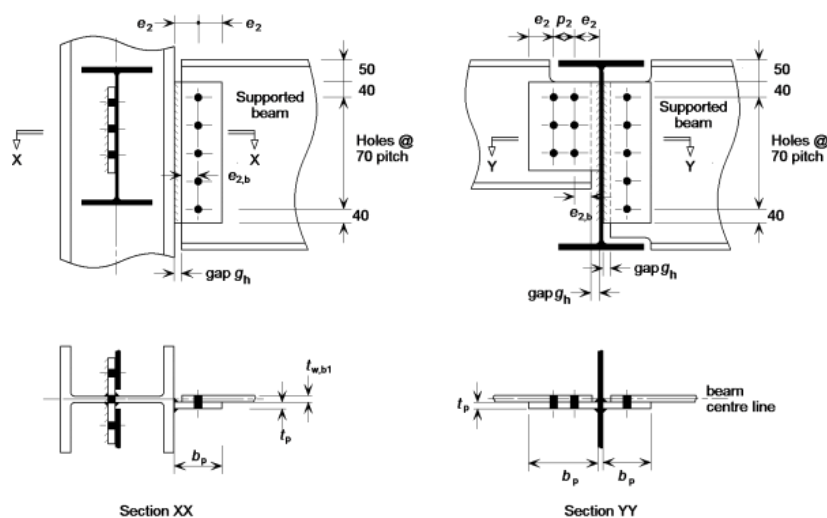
Lateral and transverse view of a fin plate connection.
